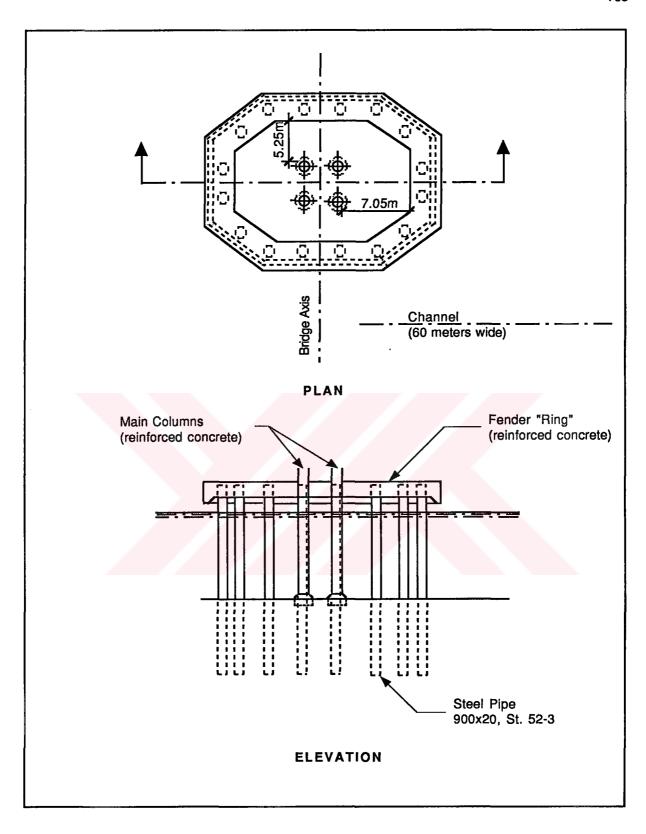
PILE SUPPORTED PROTECTION SYSTEM FOR THE TOMSO BRIDGE, NORWAY
